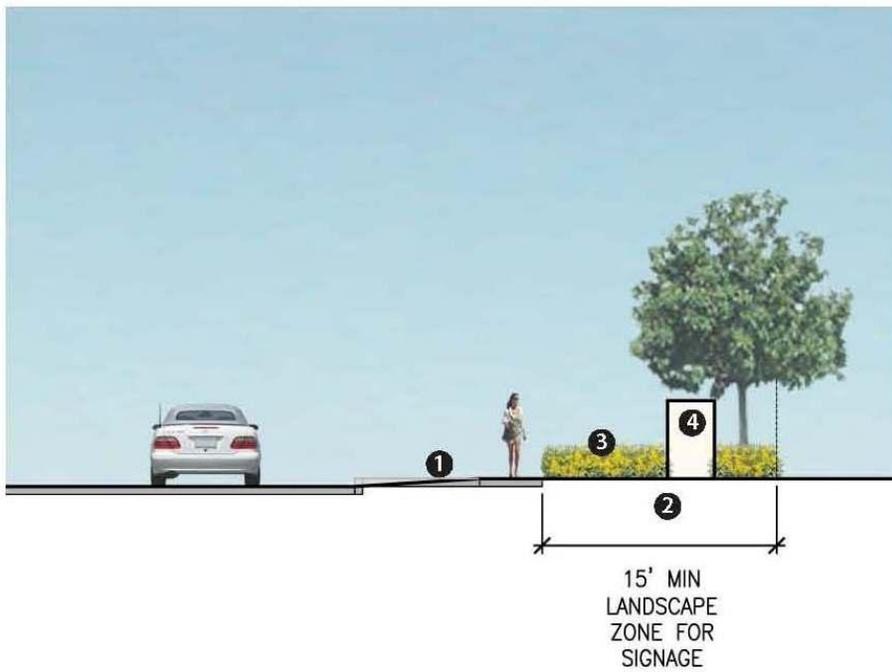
Internal Connector Road Past First Intersection
